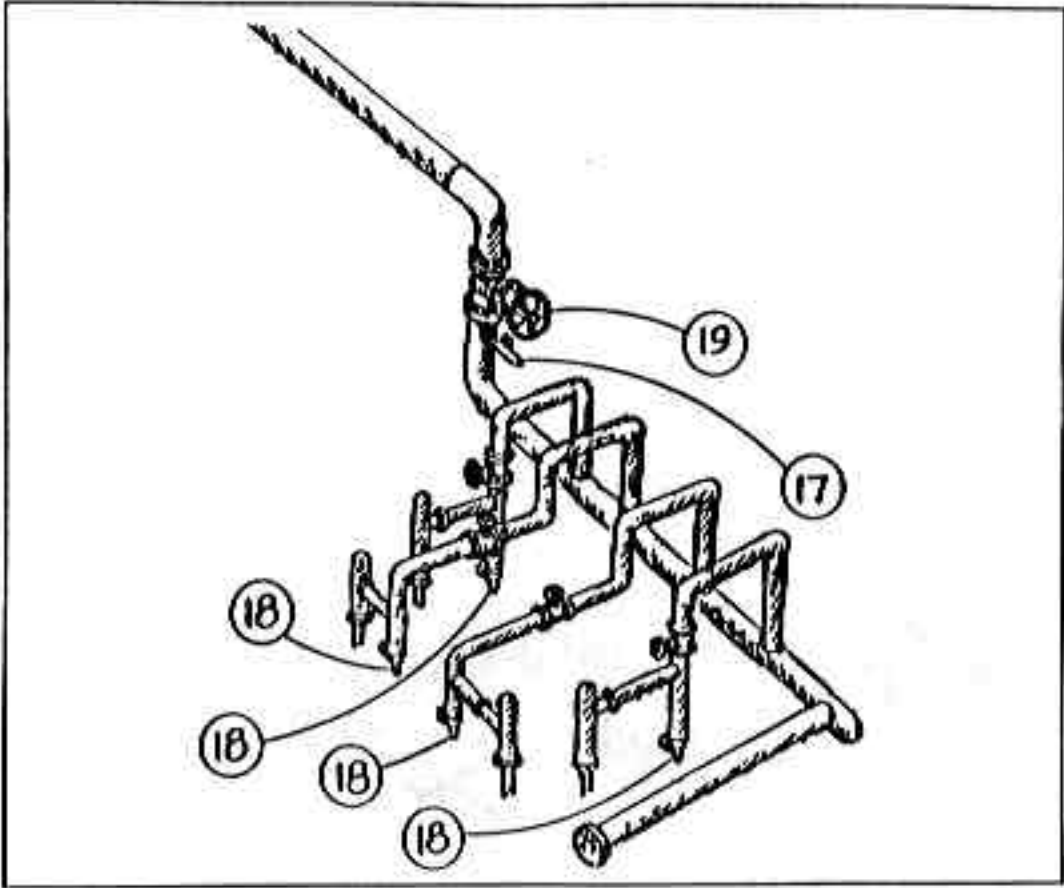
PIPING DETAIL -- WATER-WASHING AREA
